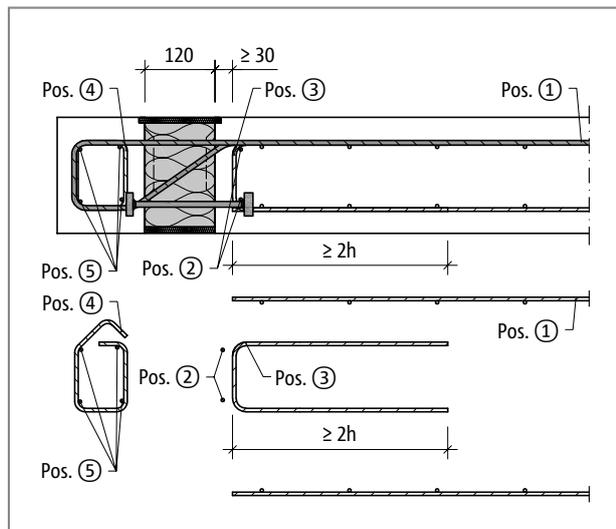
Schöck Isokorb® XT type O: On-site reinforcement
